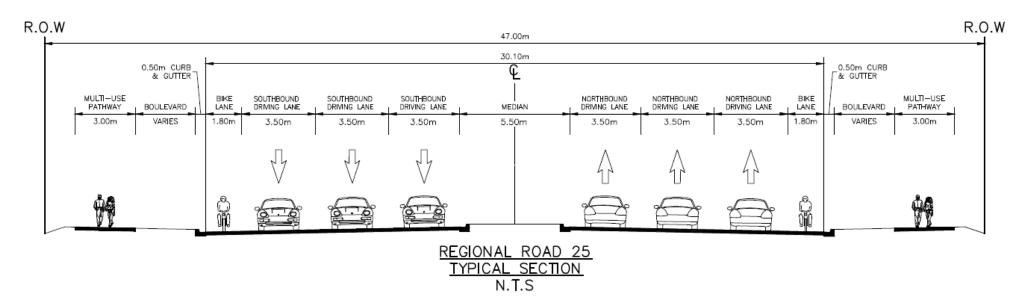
Regional Road 25 Proposed Typical Cross-Section
